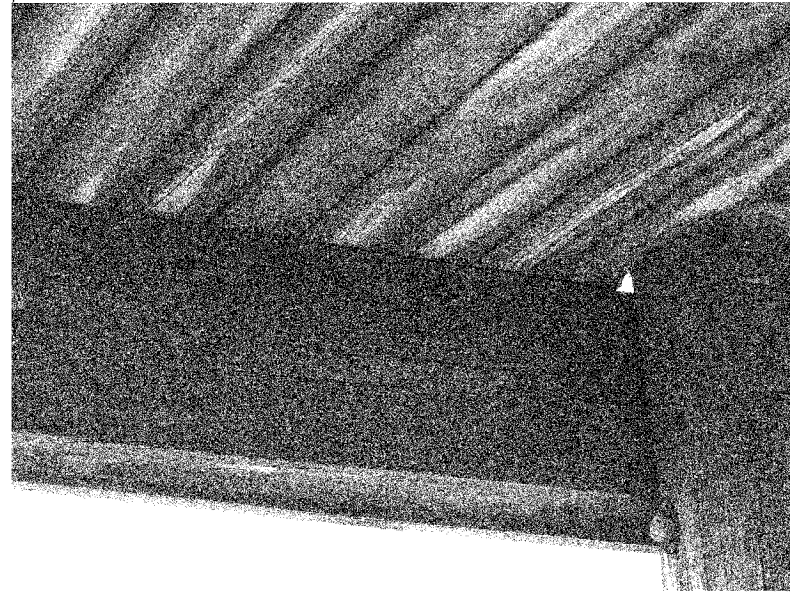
(First Level) 8"x14" Edge Beam at North Side showing Horizontal Cracks at Mid Depth for the Full Length.
